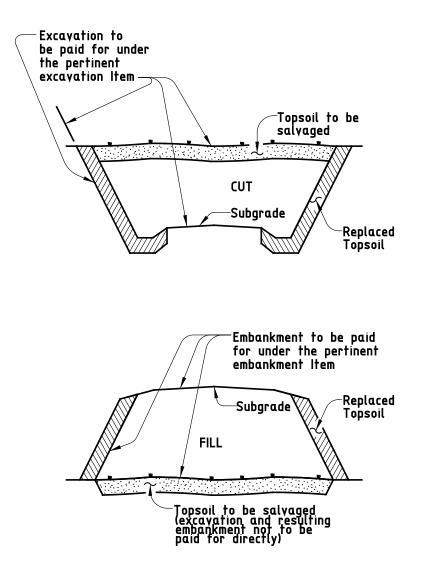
Roadway Cross-Sections Showing Payment for Excavation and Embankment
